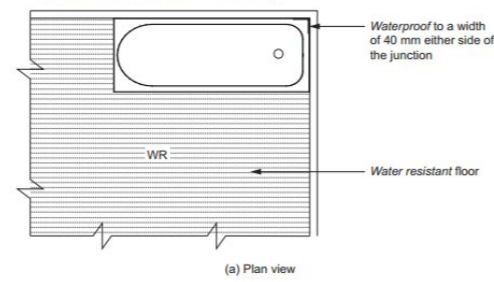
Areas adjacent to baths and spas without showers for timber floors including particleboard, plywood and other floor materials
